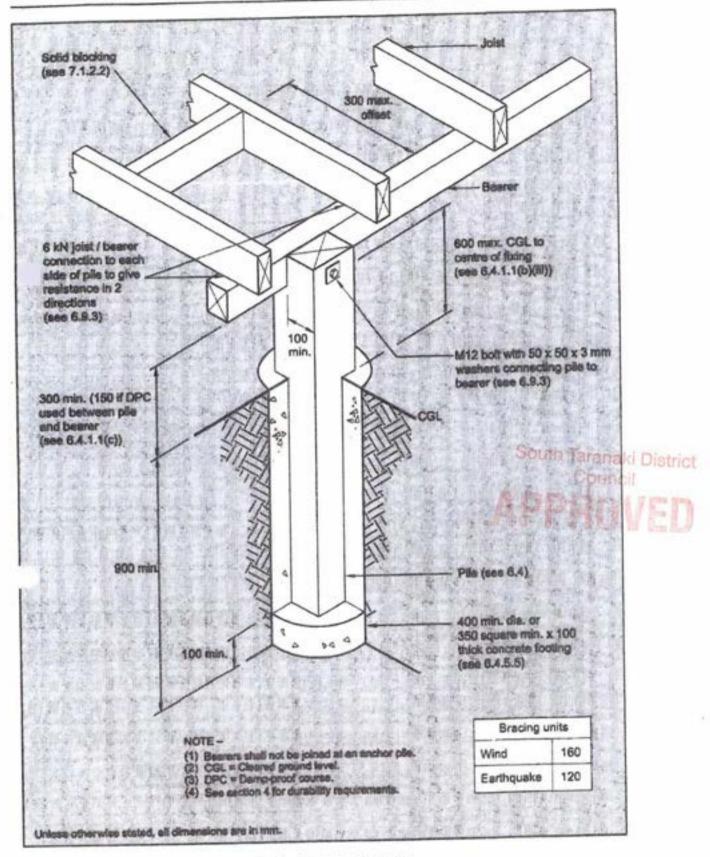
Anchor pile directly connected to bearer only (see 6.9)
